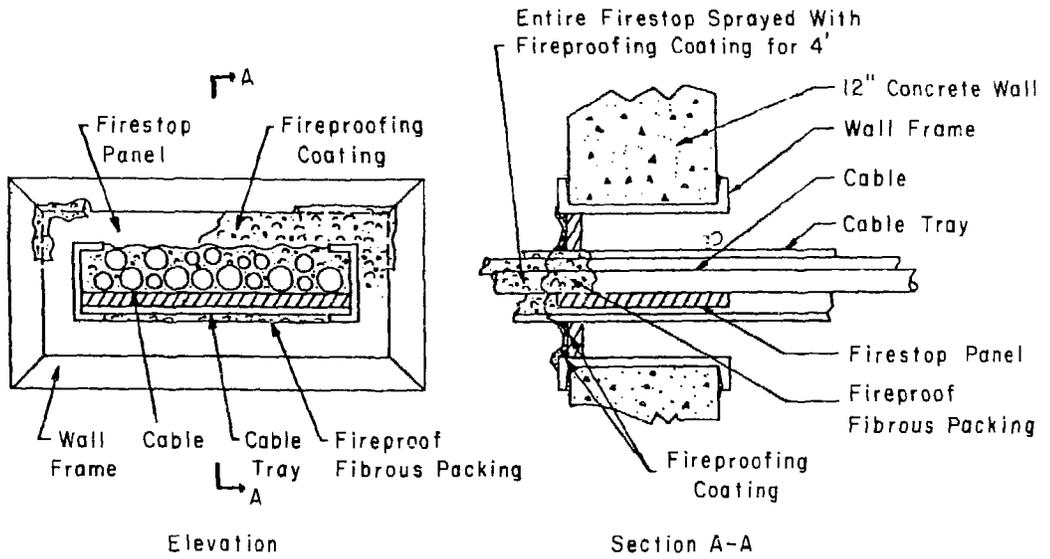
Penetration Seal for Typical Prefabricated Channel Frame Wall Opening.
